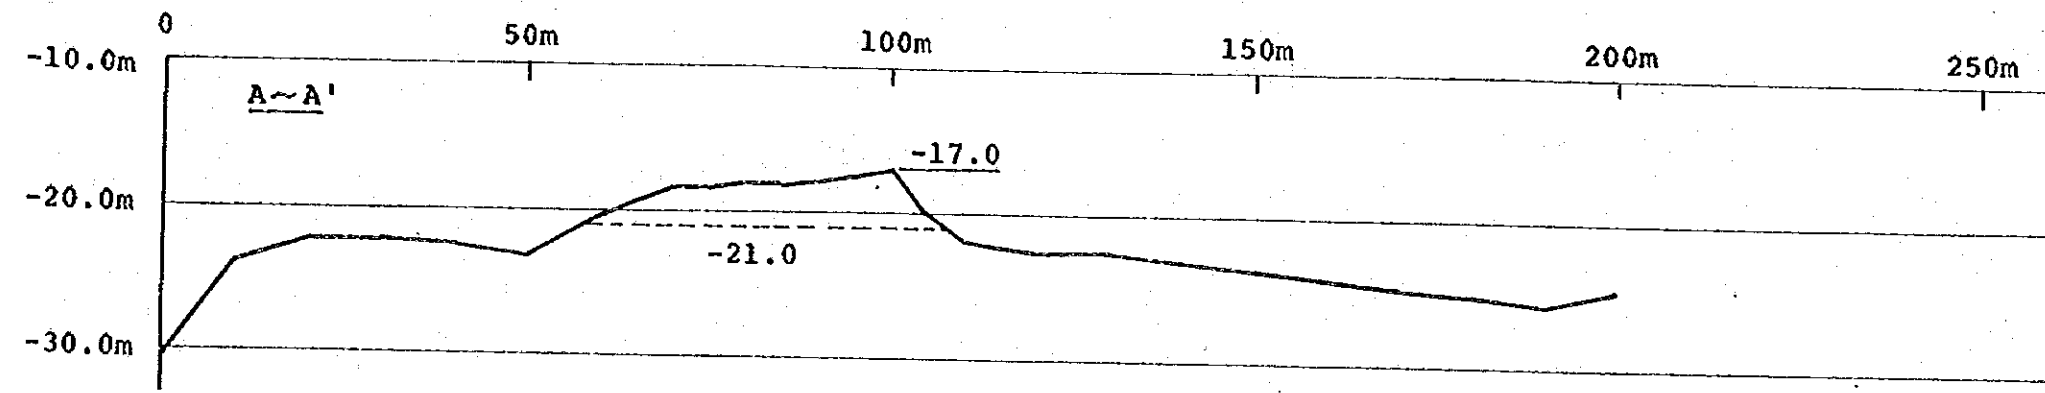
Typical Cross-Section of Shoal-D
